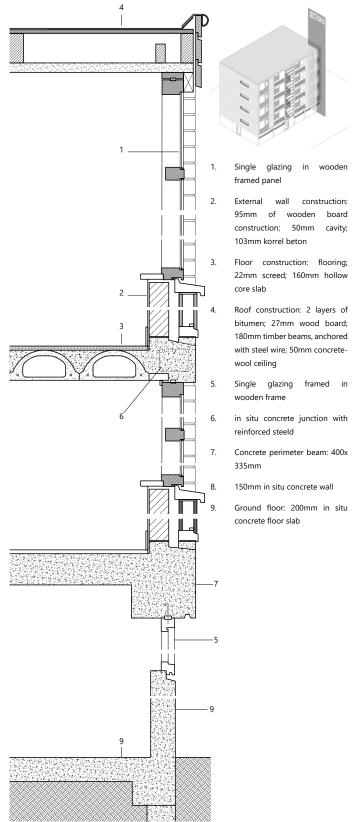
detailed section through west elevation (1:20) redrawn from archived drawings.
